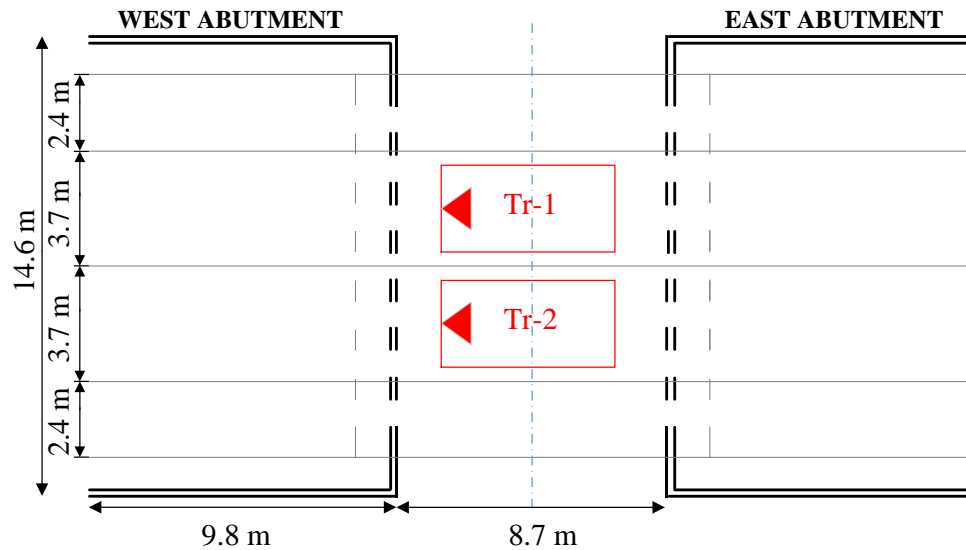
Live load test, truck position number 2 (P2) – trucks facing west.
